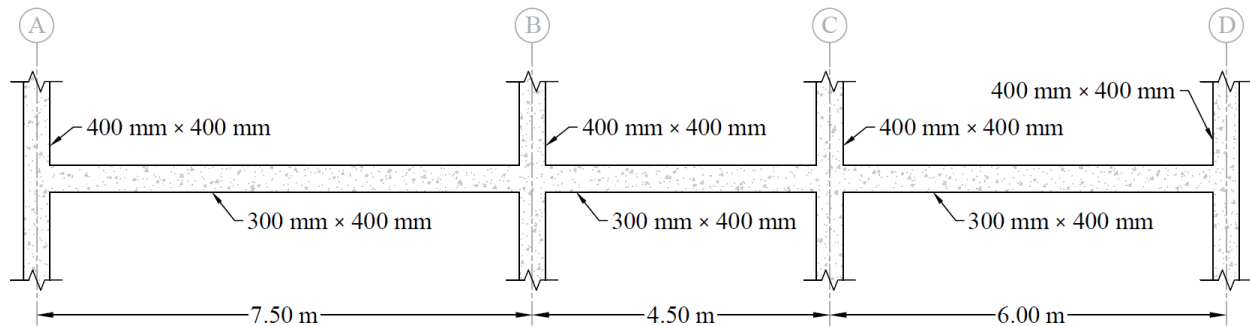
Reinforced Concrete Continuous Beam at Intermediate Floor Level
